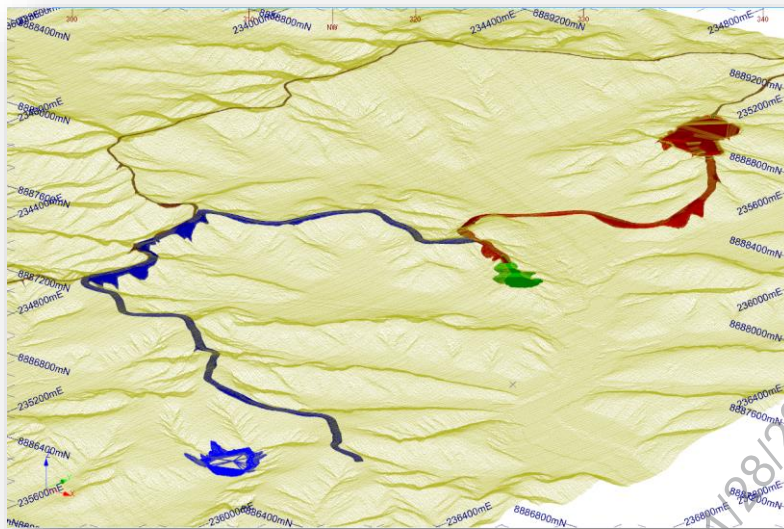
3D plan view of demonstration mining and processing layout
